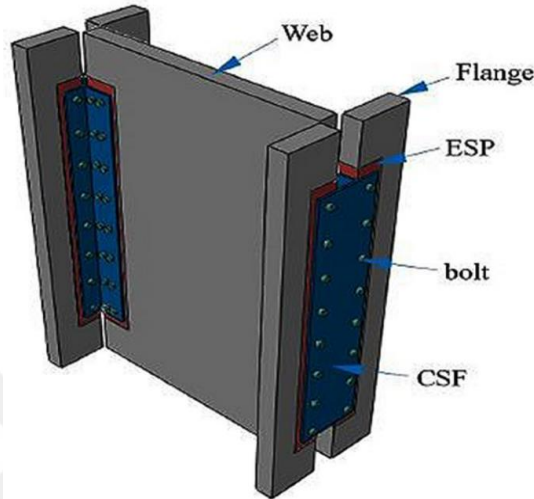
Ordinary Bolt-Connected Shear Wall System.
